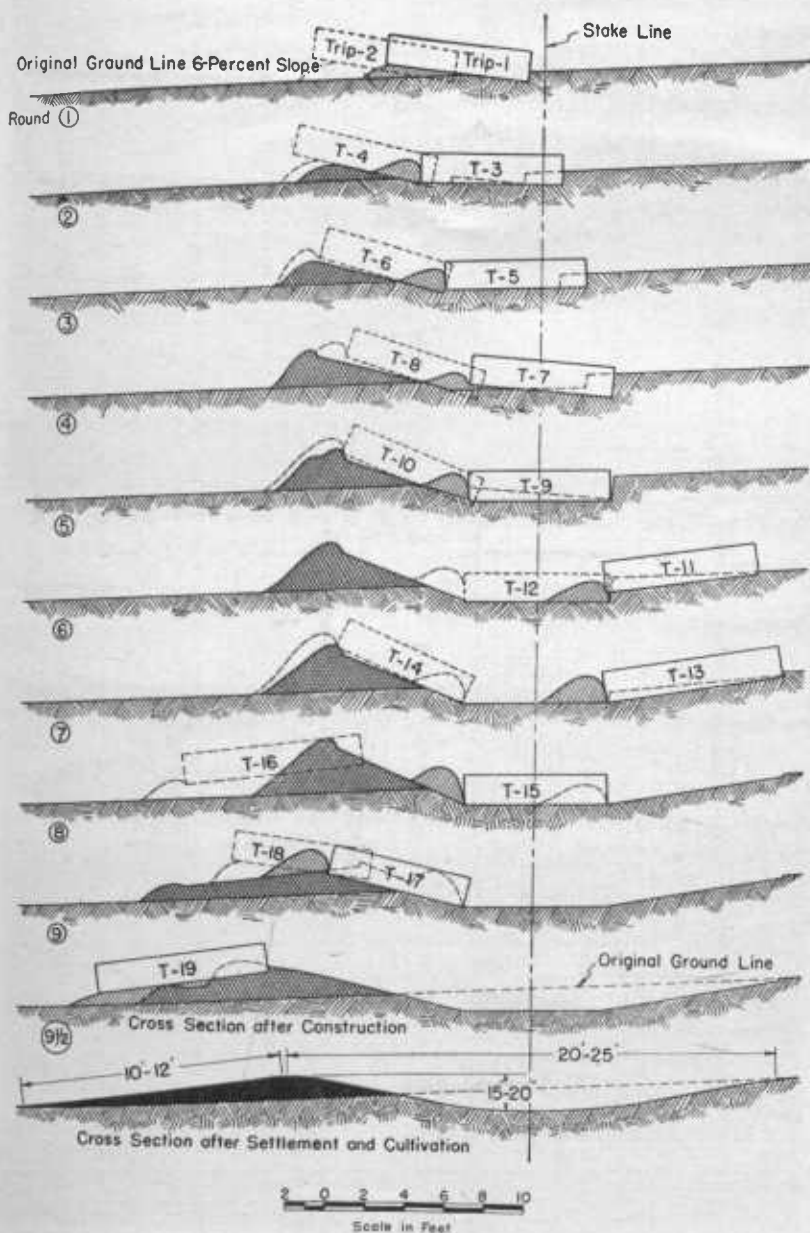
Progressive steps in constructing a drainage-type terrace in the Midwest with a 10-foot blade terracer. The terrace is constructed from the upper side only.
